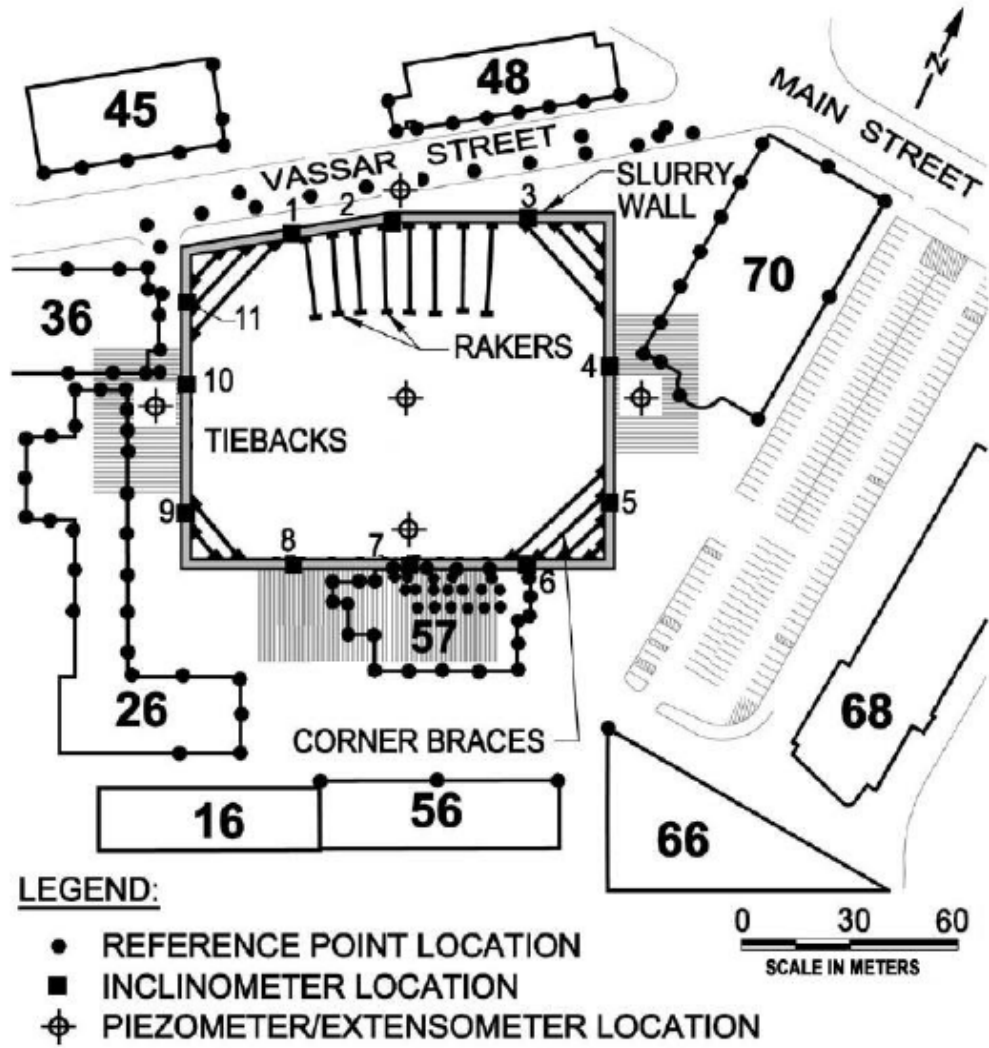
Plan of Stata Center basement, adjacent buildings and monitoring locations (adapted from Hewitt et al., 2003)
